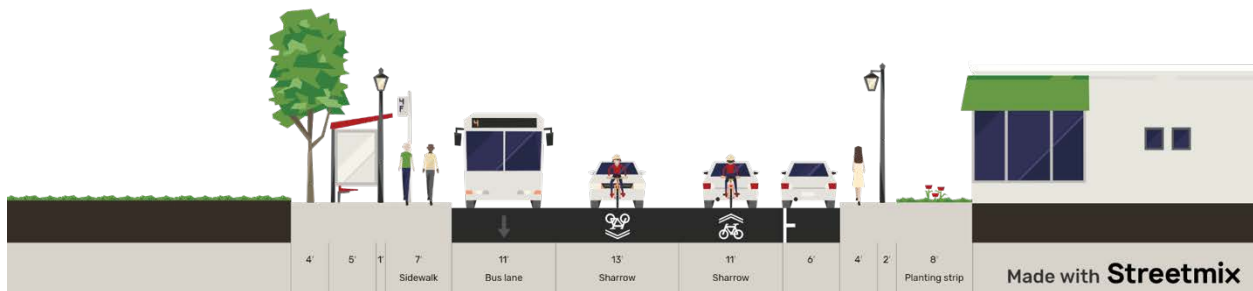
Proposed layout for the northern portion of Carroll Street, looking north from the baseball field. A bus shelter with wayfinding information would be installed to replace the current bench. Bike sharrows will be added to the road, and sidewalks will be upgraded to be ADA-compliant. New pedestrian-scale lighting will also be installed, and additional trees will be planted on the park side for shade. Diagram created in Streetmix by EC, 2022.
